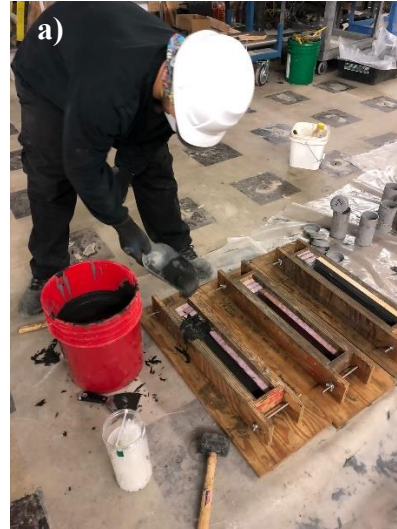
Pouring of UHP-FRC into Direct Tension Specimen Formwork
